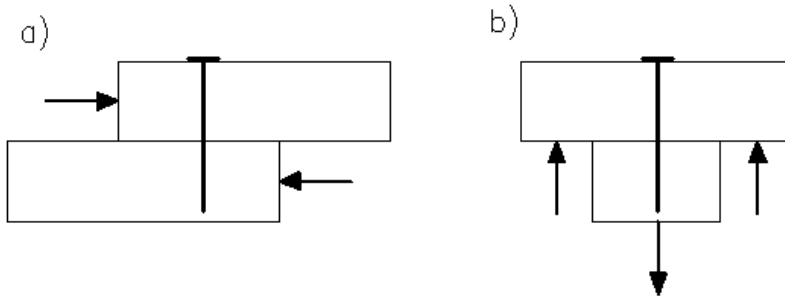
Lateral loading (a) and withdrawal loading (b)
